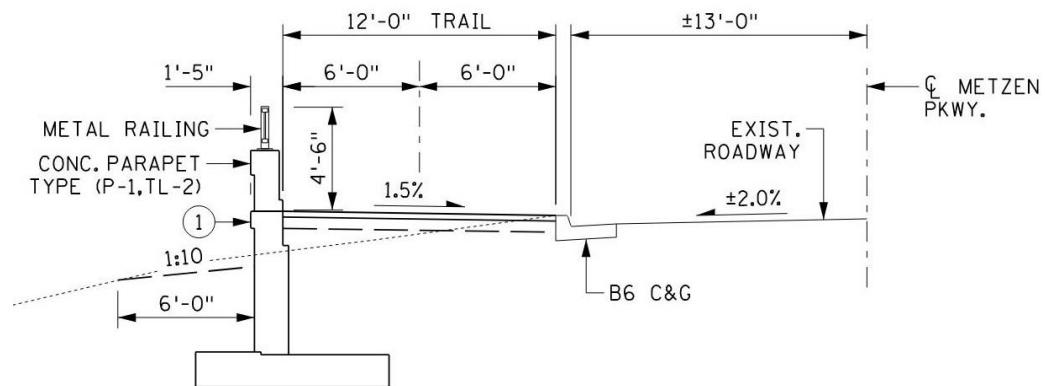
Recommended Approach Alternative 2 with Trail at Back of Curb & Gutter
